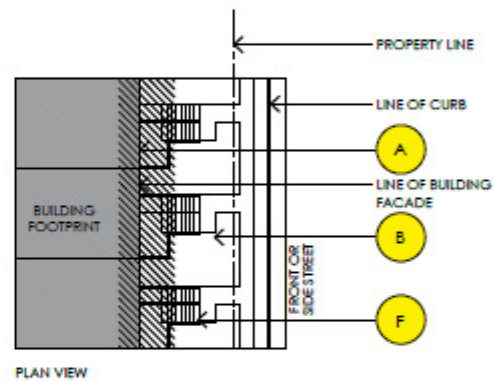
ROWHOUSE BUILDING WITH LIGHTWELL FRONTAGE
